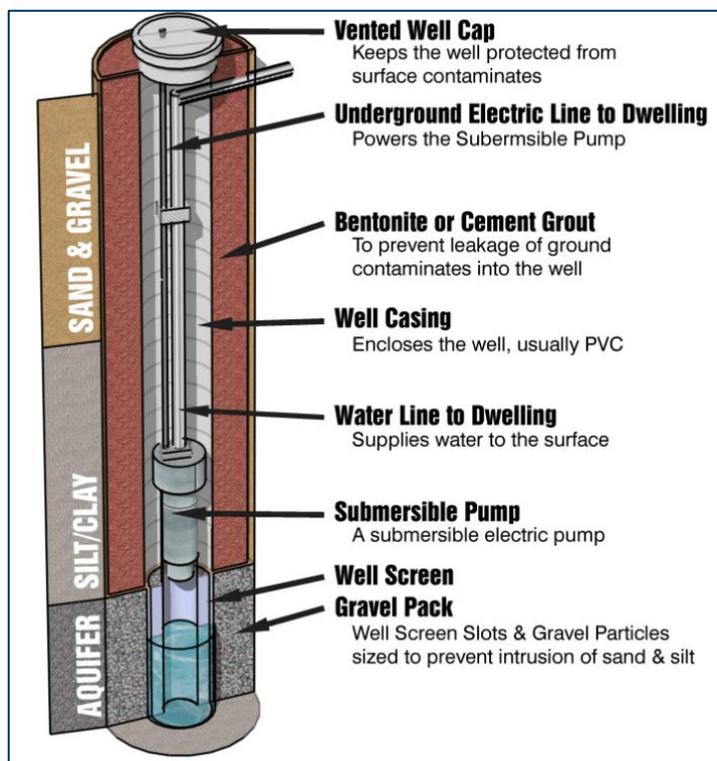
Typical bore construction (Harvard University, 2016), details to be confirmed in preliminary design phase
